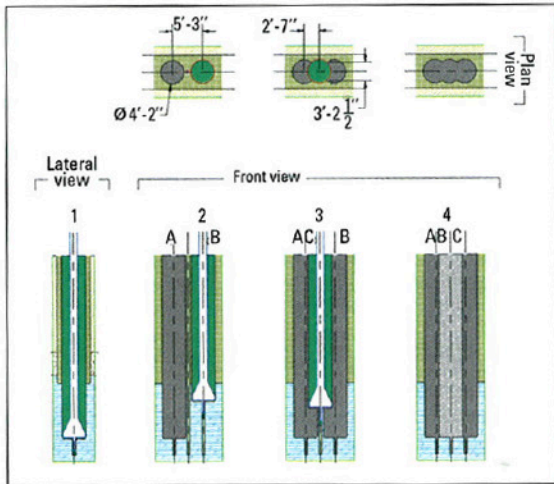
Typical installation sequence for secant piles, showing: (1) reverse circulation drilling dia. 50' in (1270 mm) down to specified depth; (2) installation of primary shafts; (3) installation of secondary shafts; and (4) a completed portion.
